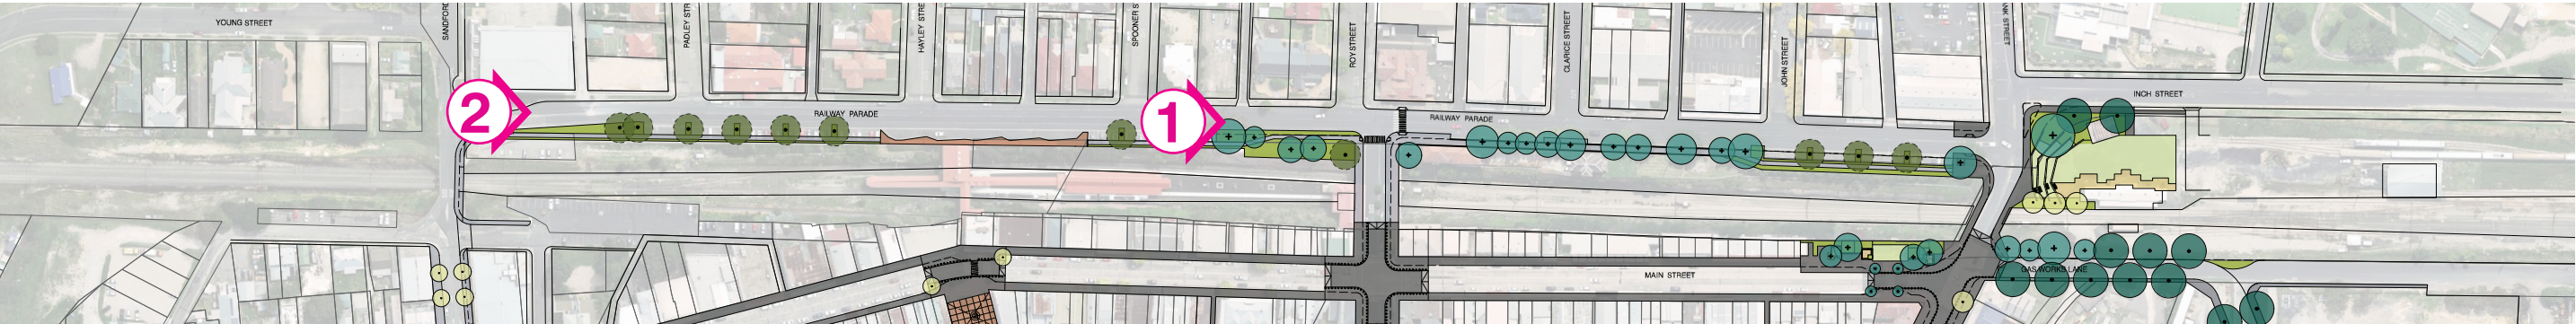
Railway Parade between Sandford Avenue and Bridge Street
